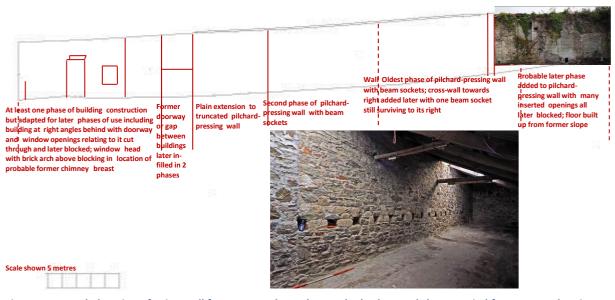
Annotated elevation of spine wall from NW to show phases, the background shape copied from survey drawings provided by the architect (see also photographs, Figs 50-64
